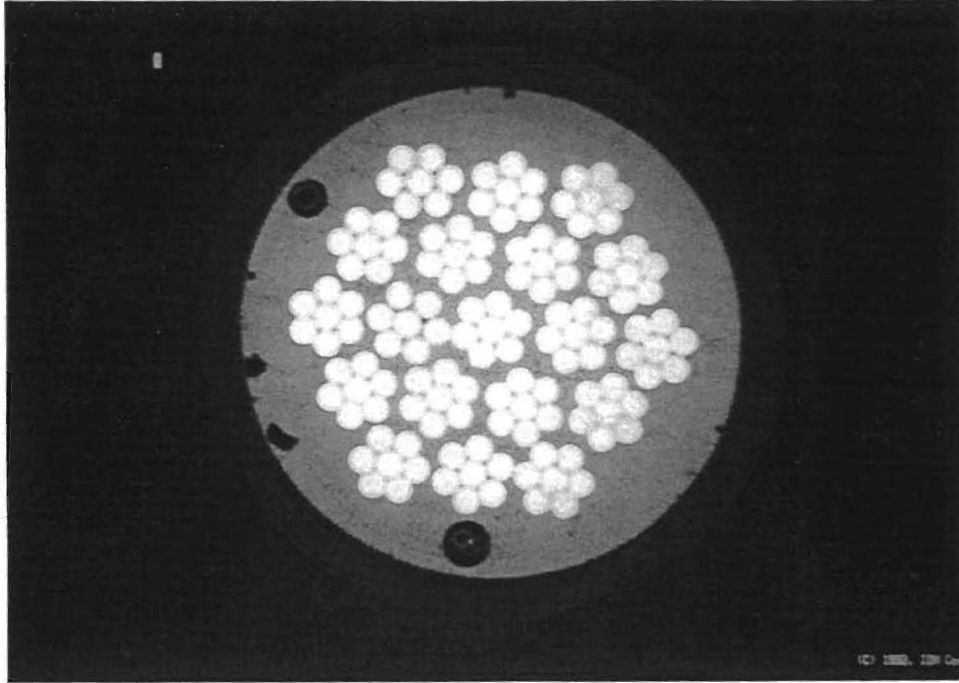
UHR scan of 4.5 in. (114 mm) cable below end cap using gamma-ray source. (C 1992, IDM Corp.)
